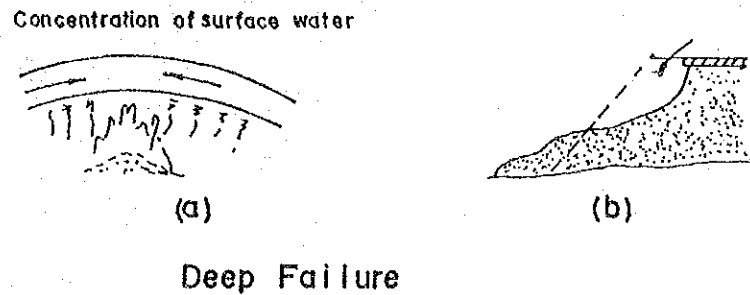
EMBANKMENT SLOPE FAILURE
